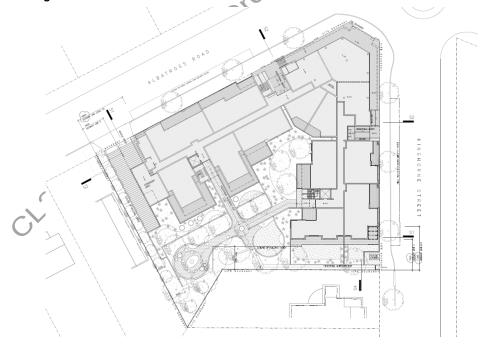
Site Plan of the proposed development. Figure 4 - Basement floor plan of the proposed development. ALBATROSS ROAD ELEVATION Elevation of the proposed development (western elevation – Albatross Road)
